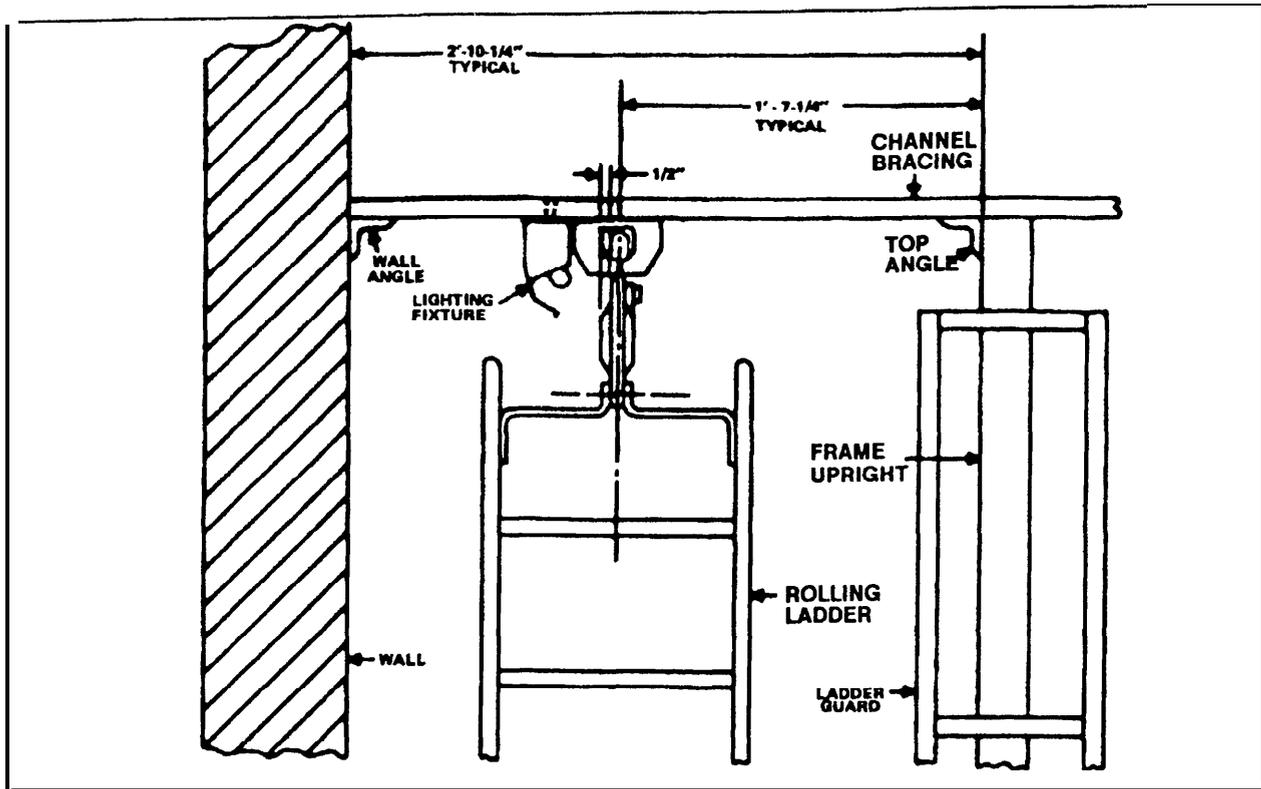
Typical Placement of Lighting Between Wall and Equipment Frame
